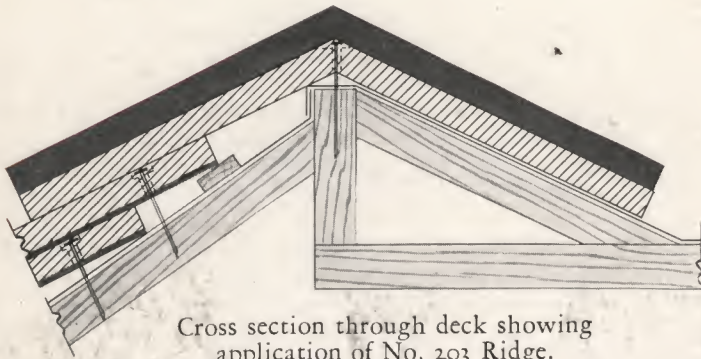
DETAILS OF "IMPERIAL" $\frac{5}{8}$ " SLAB SHINGLE TILE AND FITTINGS
